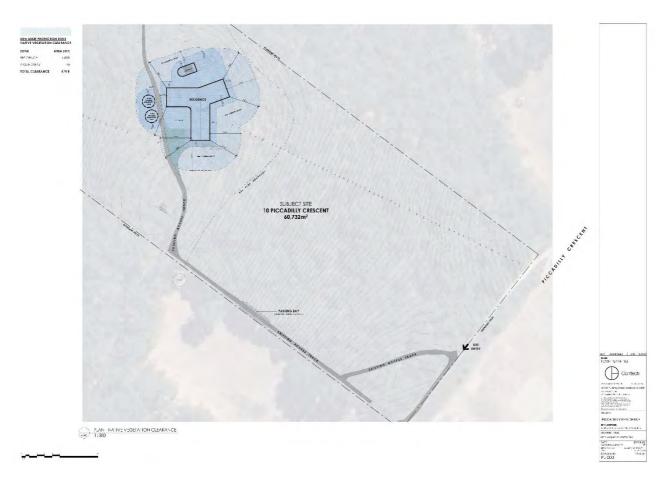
Design drawing for the development on 10 Piccadilly Crescent, Piccadilly
